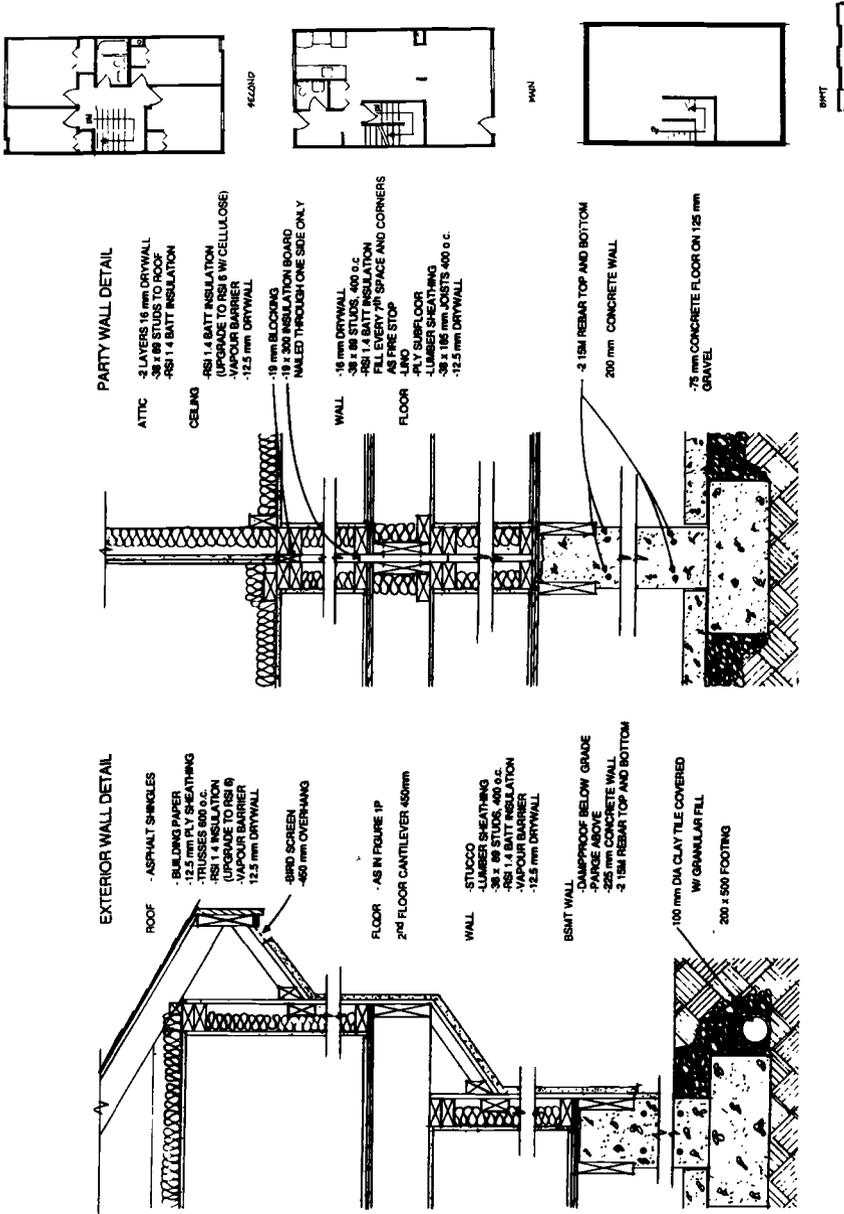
Exterior wall section, party wall section, and floor plans for Project 1.
